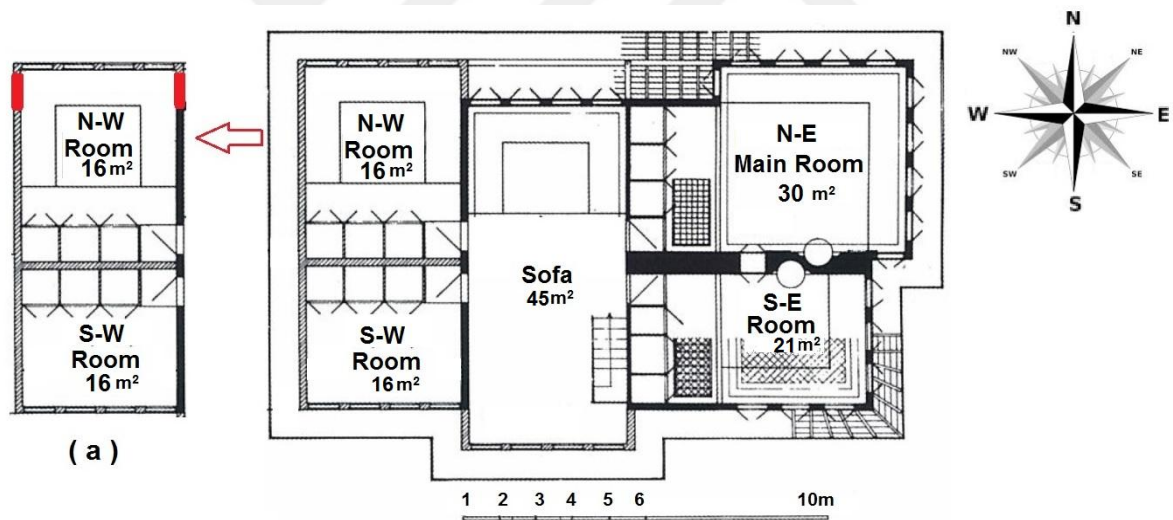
Benchmark building plan Cumba modification illustration (Talya, 2007)
